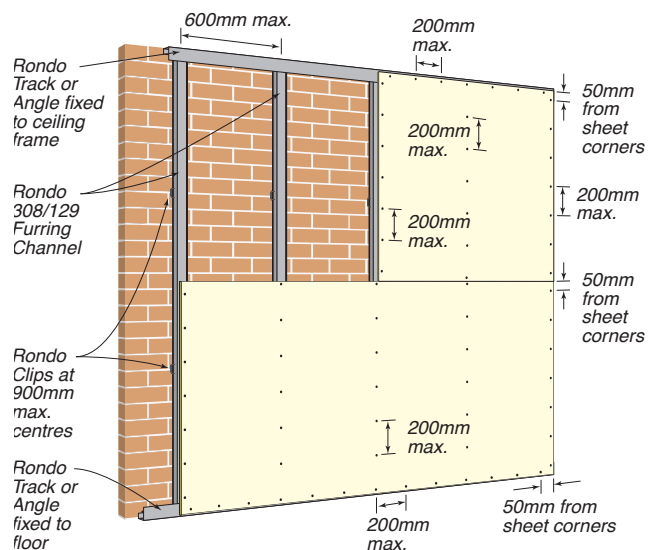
CeminSeal™ Wallboard Installation – Furring Channel and Fastener Method – Tiled Areas
